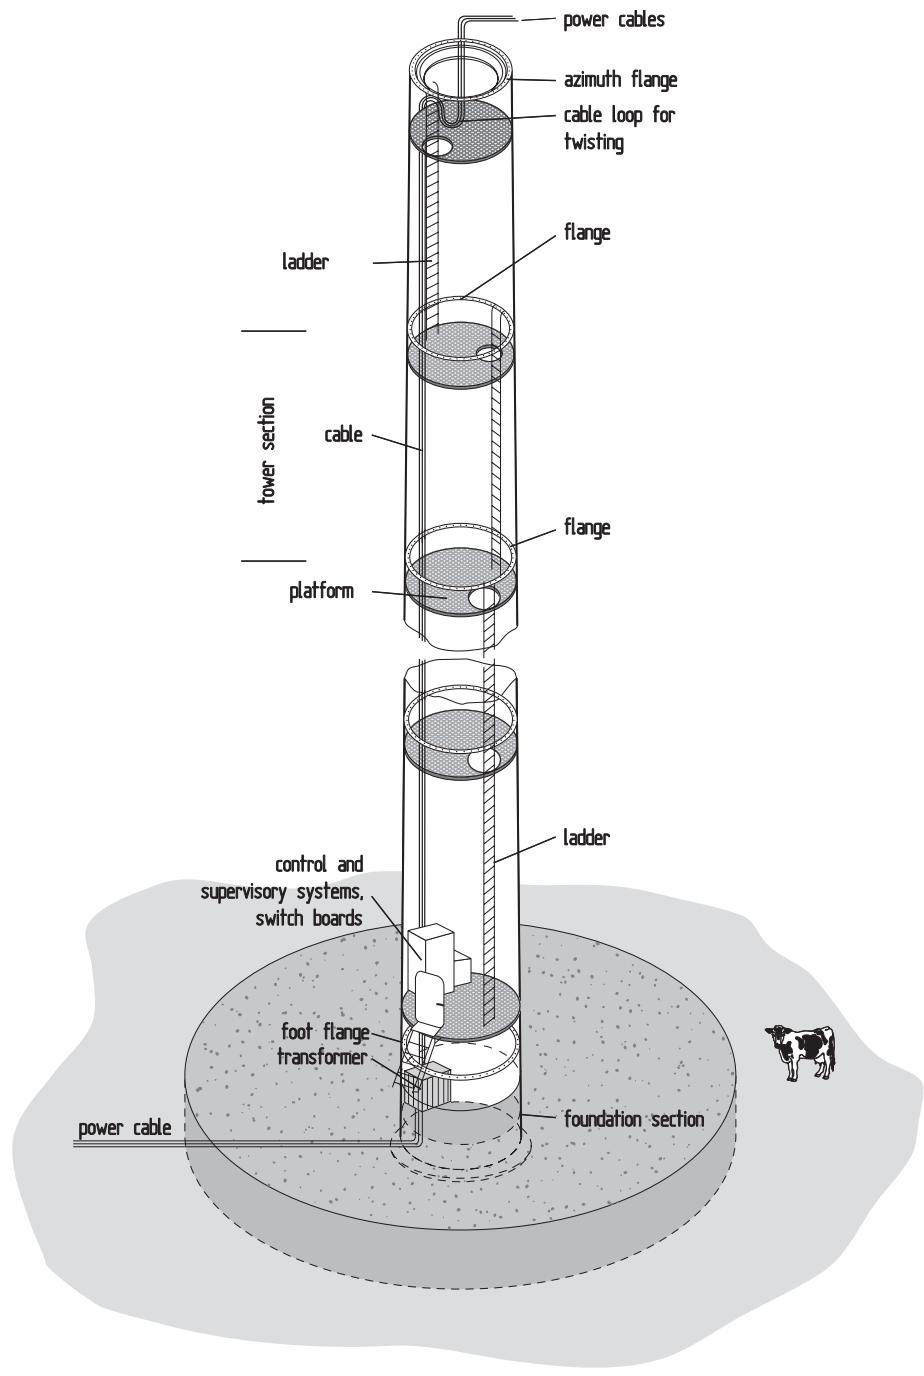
Steel tubular tower with installations of a large wind turbine
